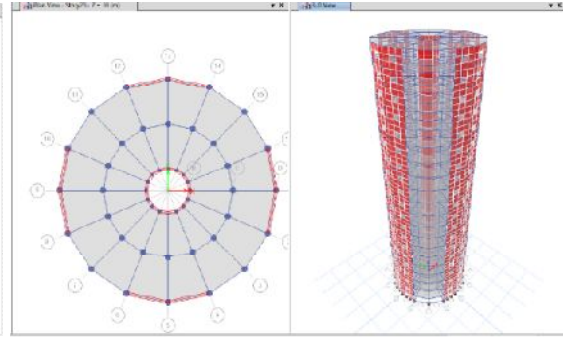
Model 6 (circular building with circular core wall and rectangular shear wall)
